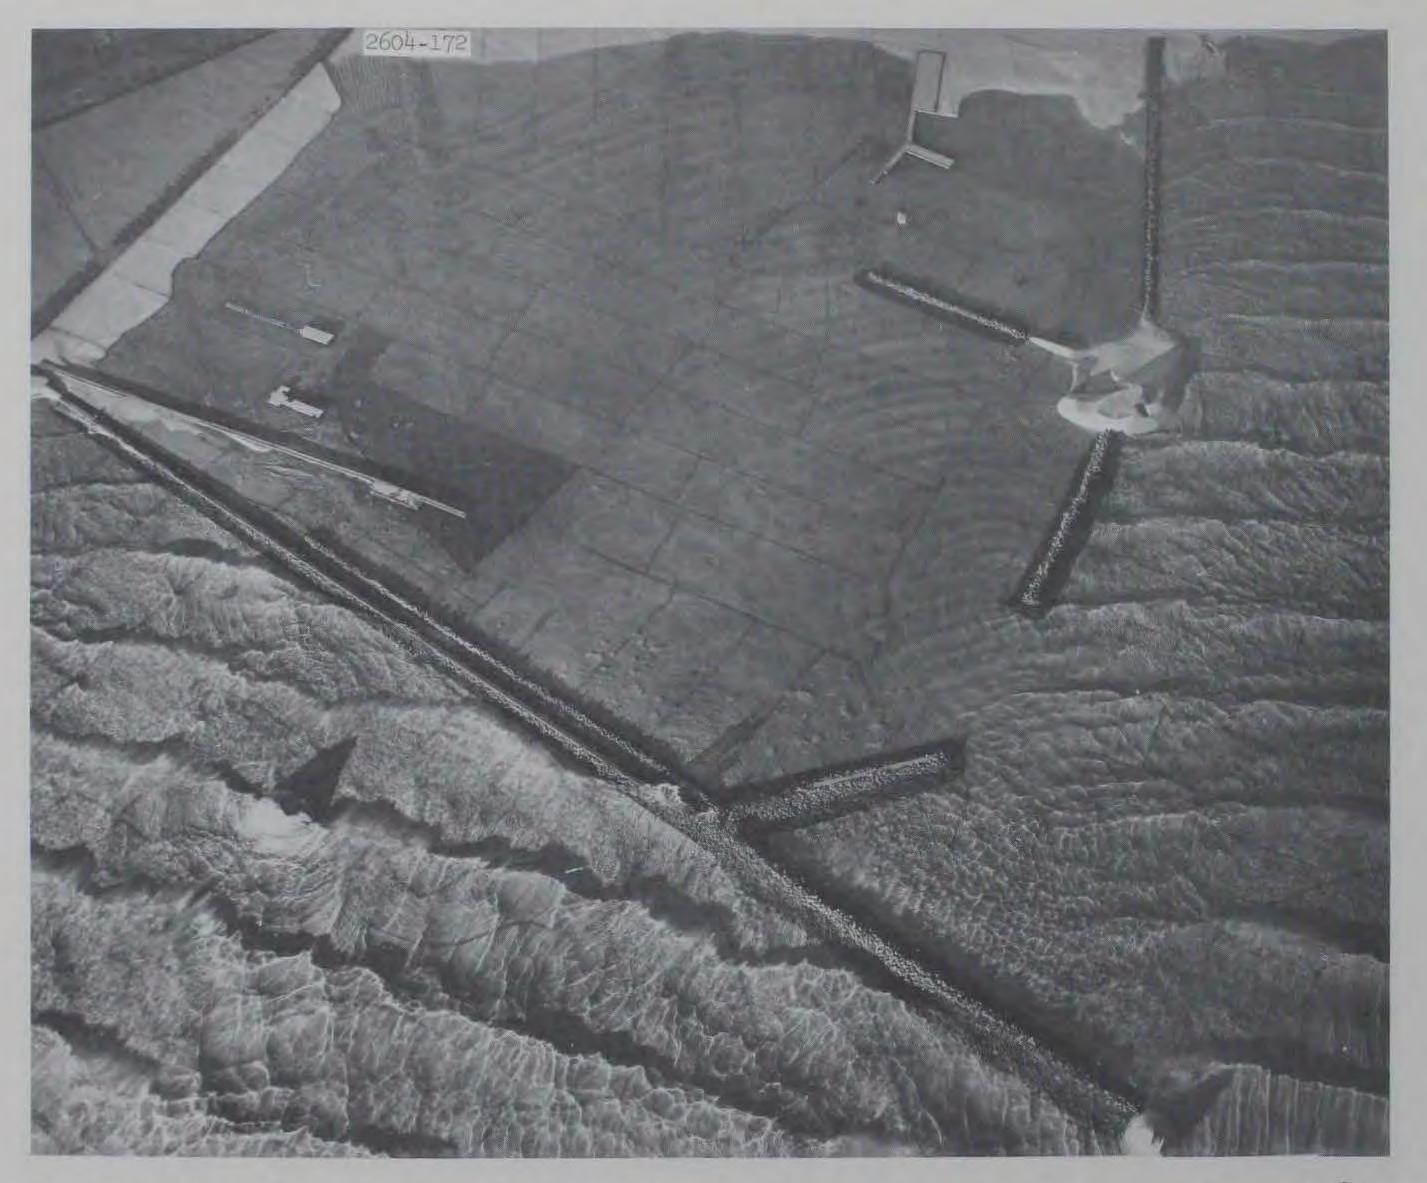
Wave patterns, plan 4; 14-sec, 22-ft shallow-water waves from S49015'W
